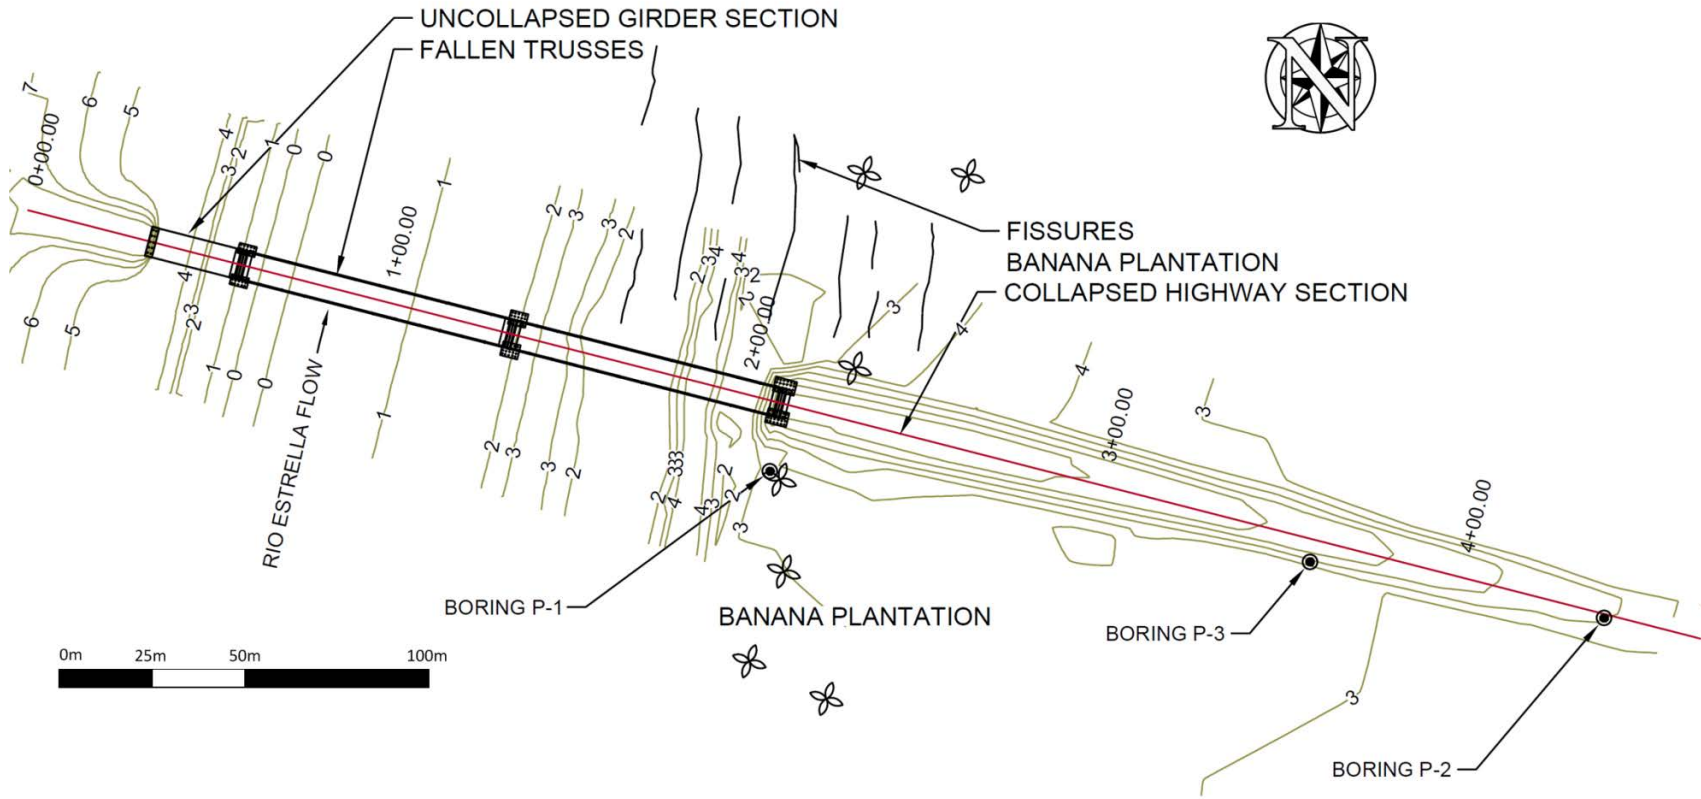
Sketch of the Current Elevation Contours and the Insuma Boring Locations at the Rio Estrella Bridge
